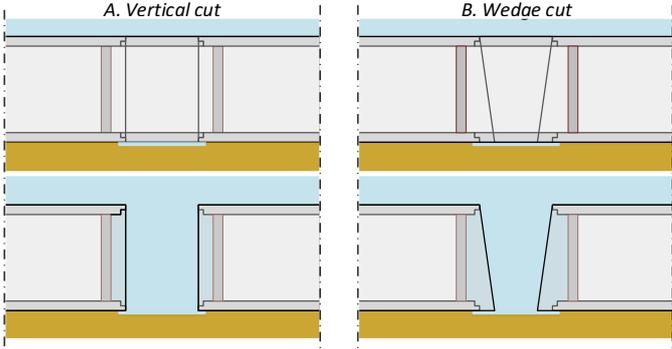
, OPENING JOINT DESIGN SHAPE VARIANTS; ; LONGITUDINAL VIEW
